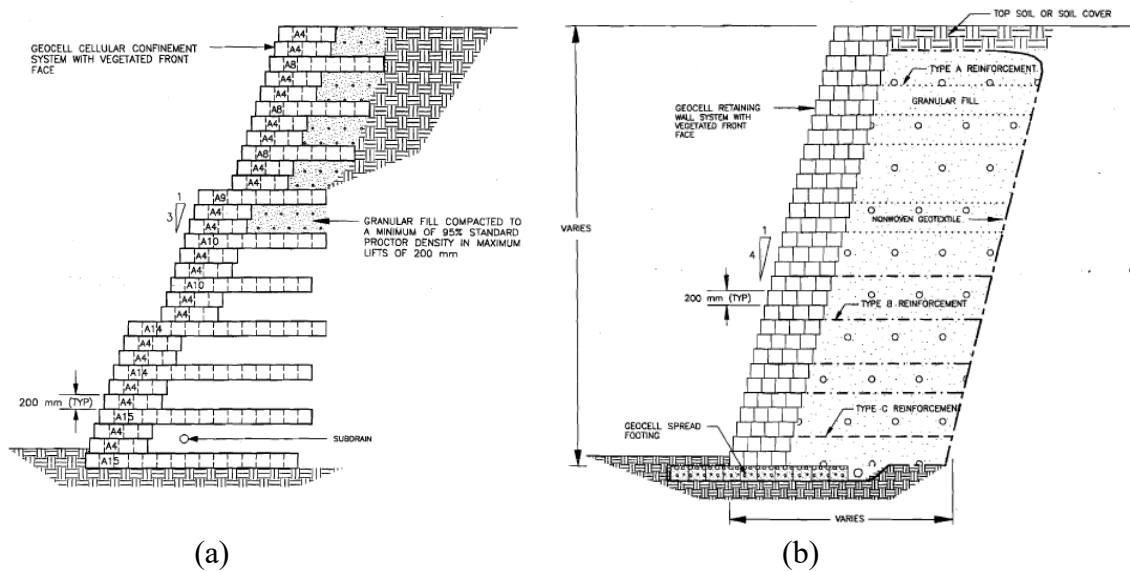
A depiction of (a) a hybrid gravity-style retaining wall constructed using geocells and (b) a geosynthetic-reinforced soil wall with geocell facia, (Bathurst and Crowe 1992)
